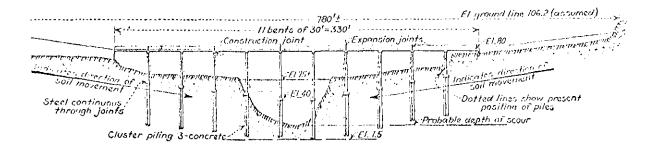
Reinforced concrete trestle over New River in Imperial Valley, showing movement of bents (40)
